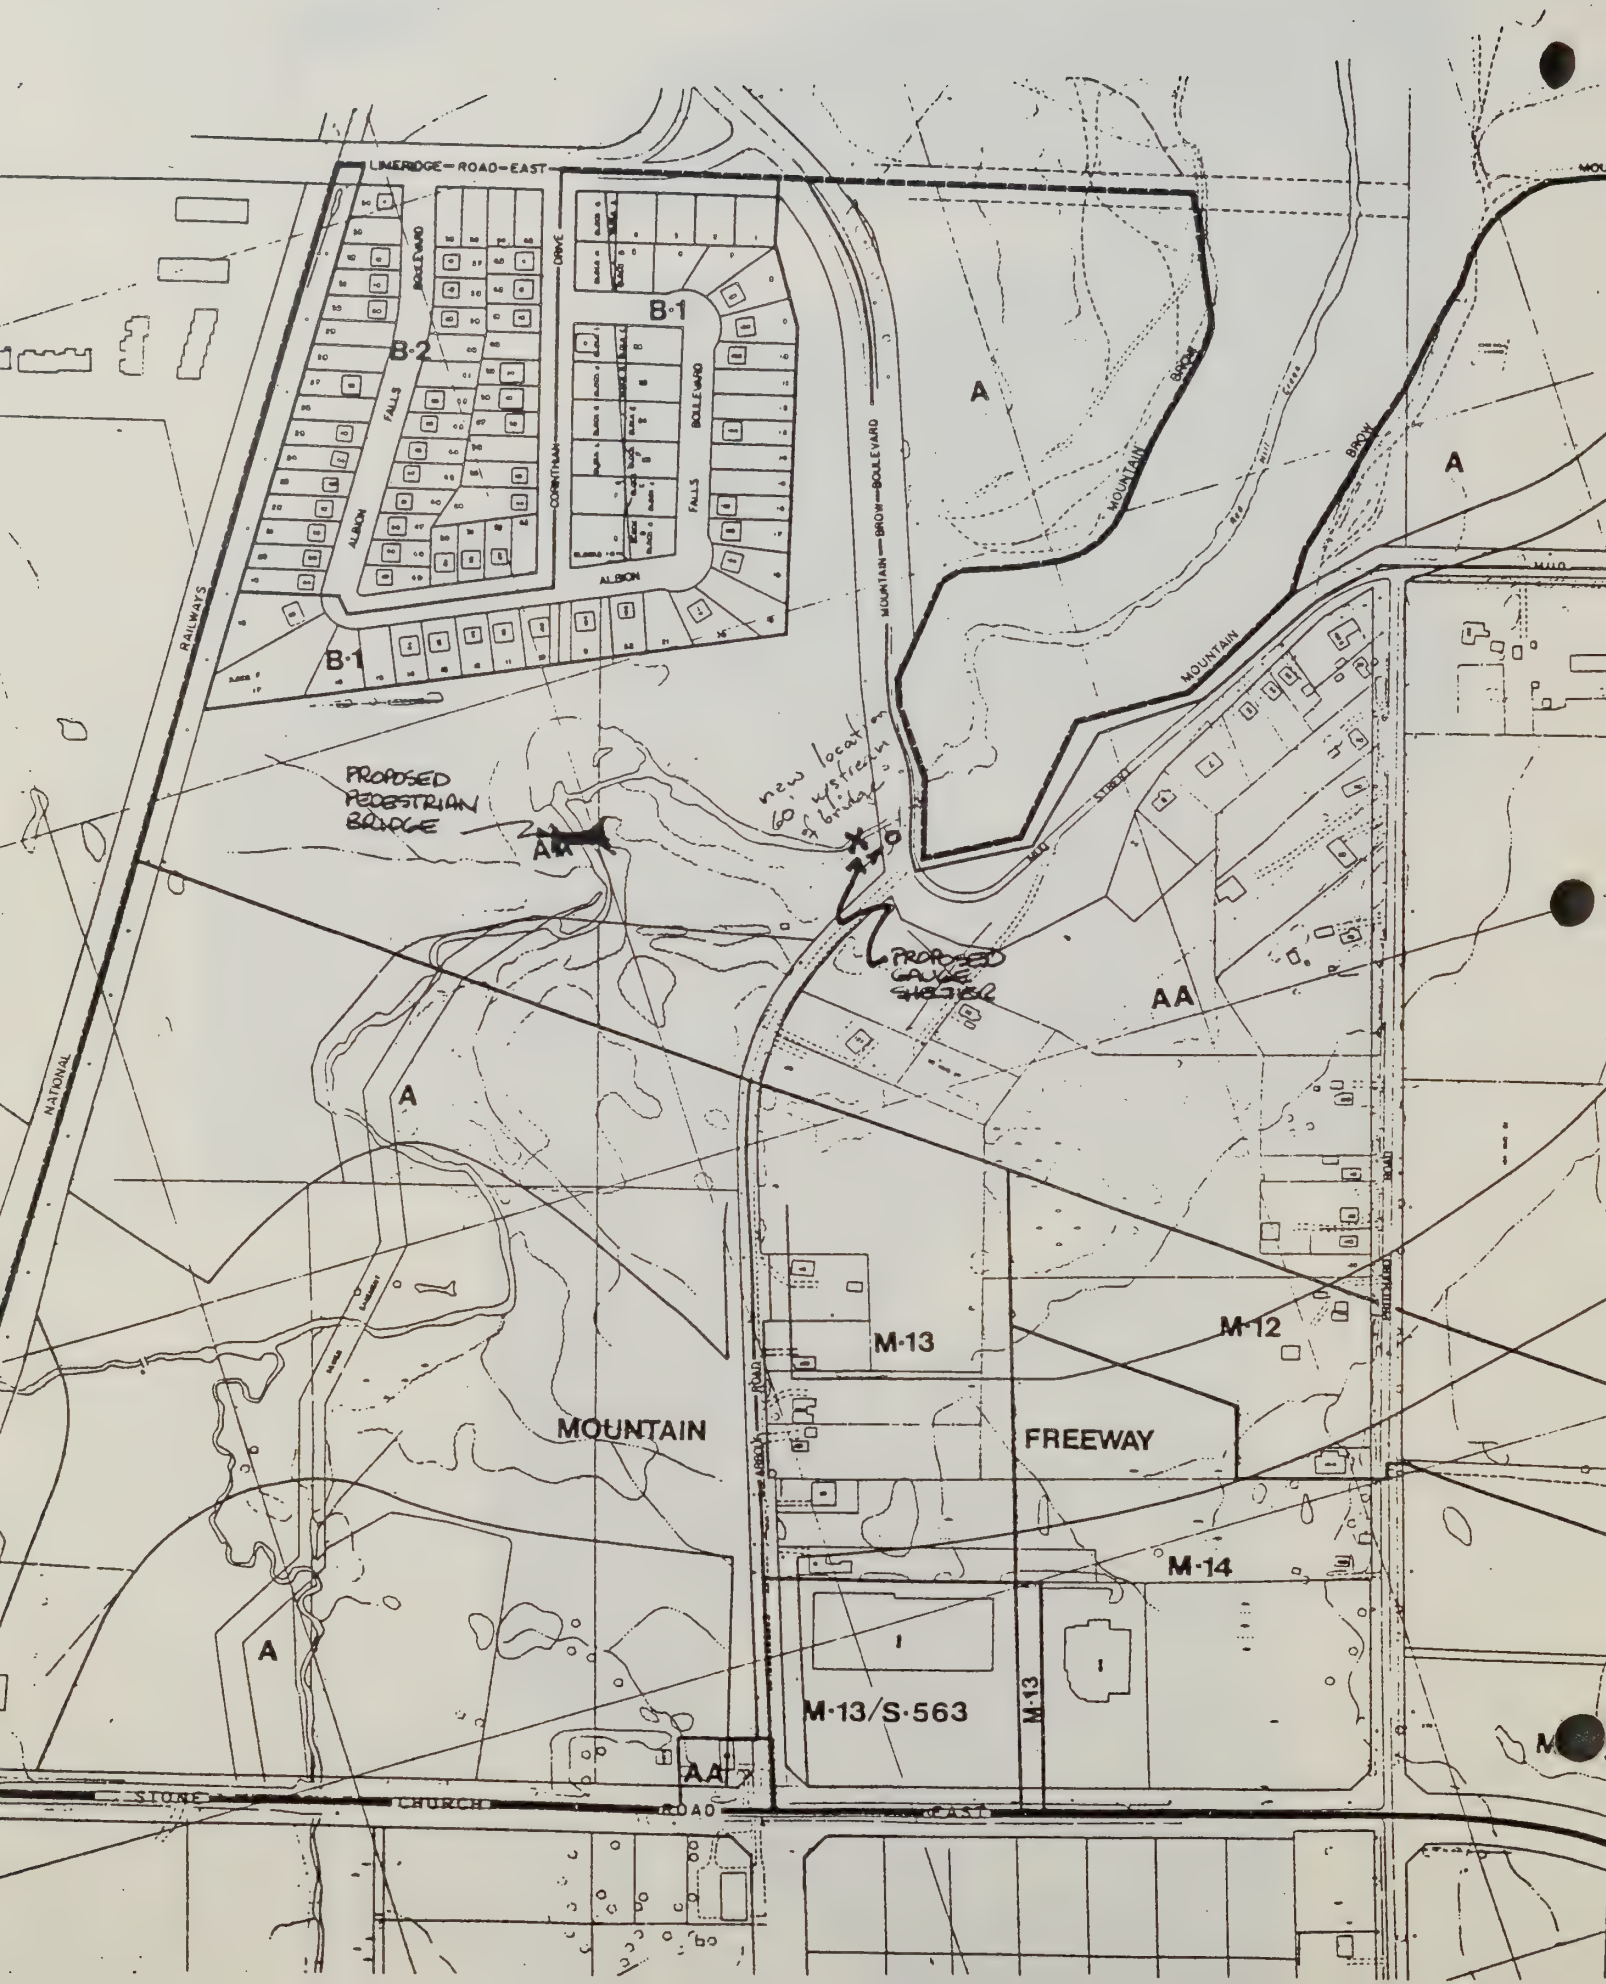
SITE OF PROPOSED PEDESTRIAN BRIDGE
